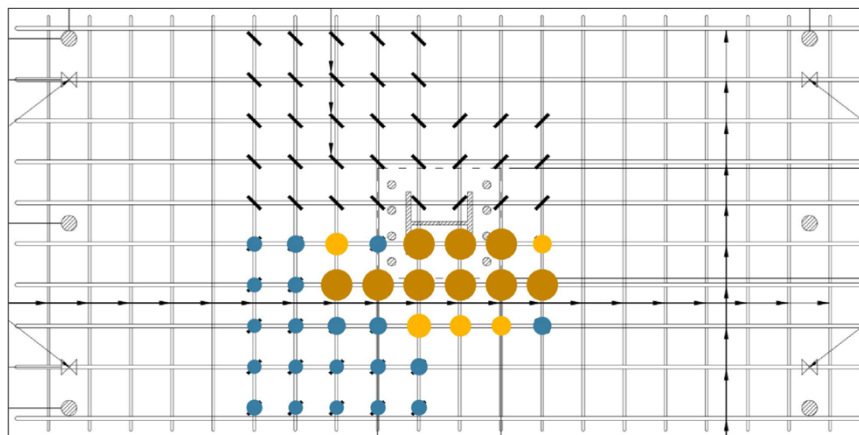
Plan view of the specimen separating the shear reinforcing into rows
